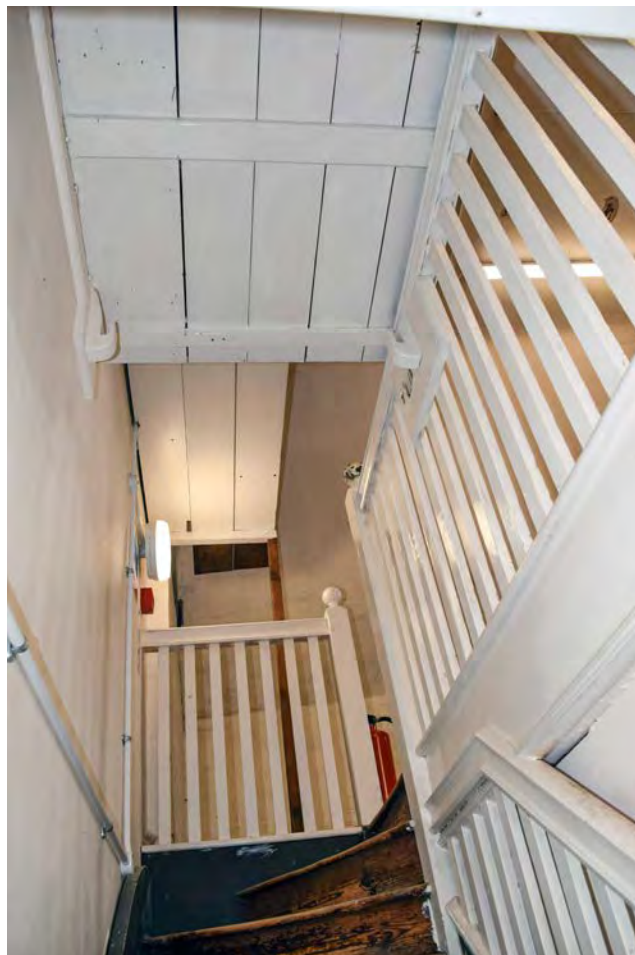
The stairway between the second and third floor of 31 Cornmarket Street, looking south
